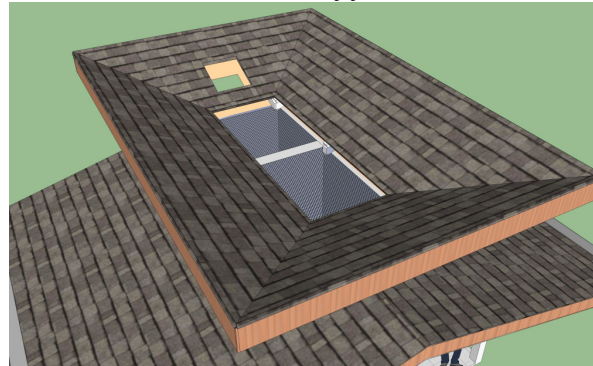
the Perspective of Water Collection Roof and Filter in the Integrated Bathing - Washing - Toilet - Water Tank Facility.
